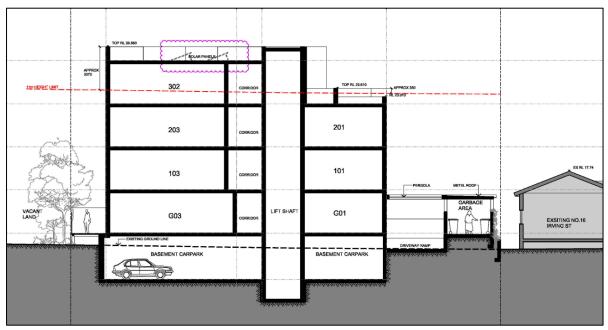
Extract of Section 4 showing exceedance in building height. (Original Plans)
